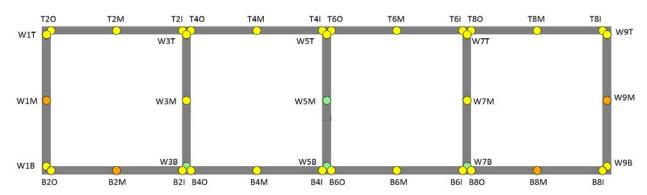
Test culvert: 4-span, 10ft x 9ft culvert (MC10-3 design) w/ critical sections identified
